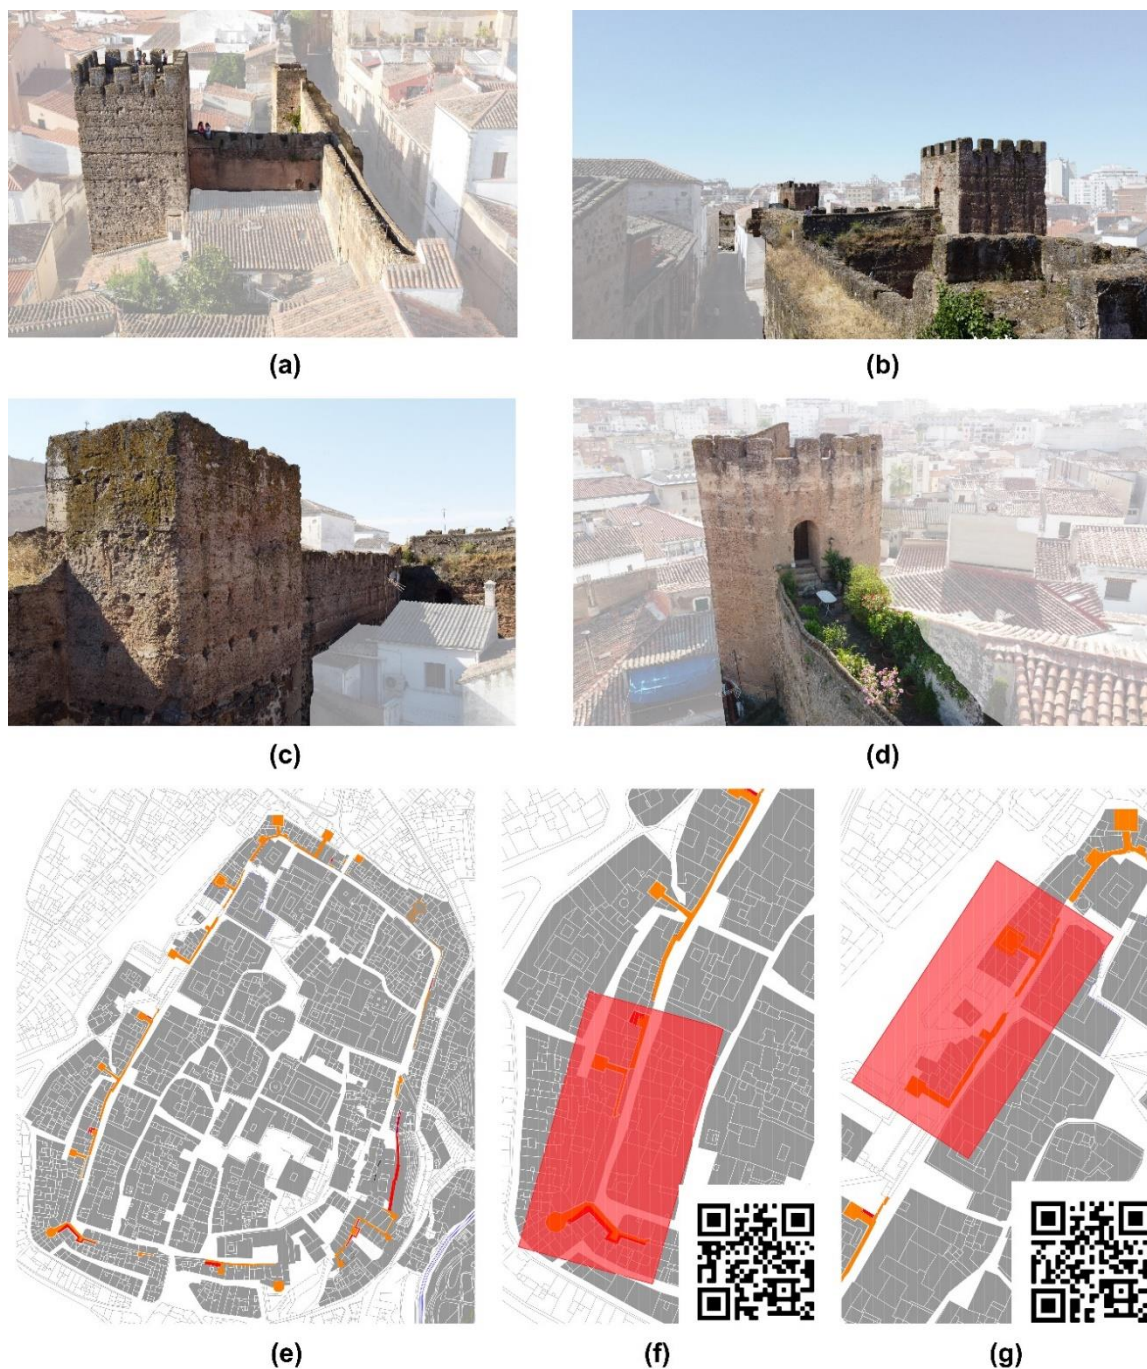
Areas of intervention: (a) Aerial view of the Aver tower, (b) view of the fortified complex from the intrados of the wall. Aver tower in the foreground, (c) Aver cube. Behind the canvas, (d) aerial view of the Ochavada tower, (e) plan of the study area. Right canvas, cube and Ochavada tower. Left canvas, cube and Aver tower; (e) walled enclosure of the city of Cáceres; (f) intervention area I: Redonda Tower and Aver Tower; (g) intervention area II: Bujaco Tower, Pulpits Tower and Arco de la Estrella.
